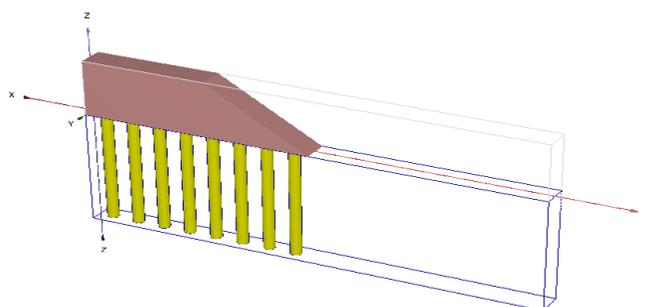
Three dimensional model of the embankment supported by reinforced stone column
